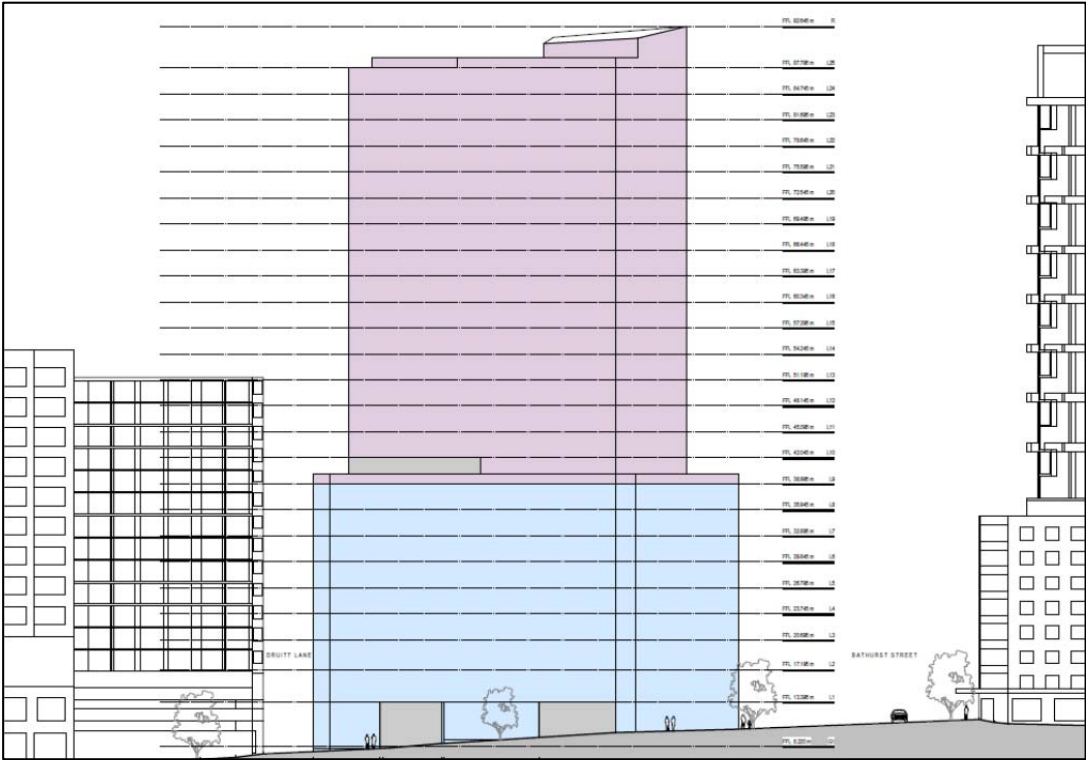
The western elevation of the proposed building envelope, as viewed from Sussex Street
